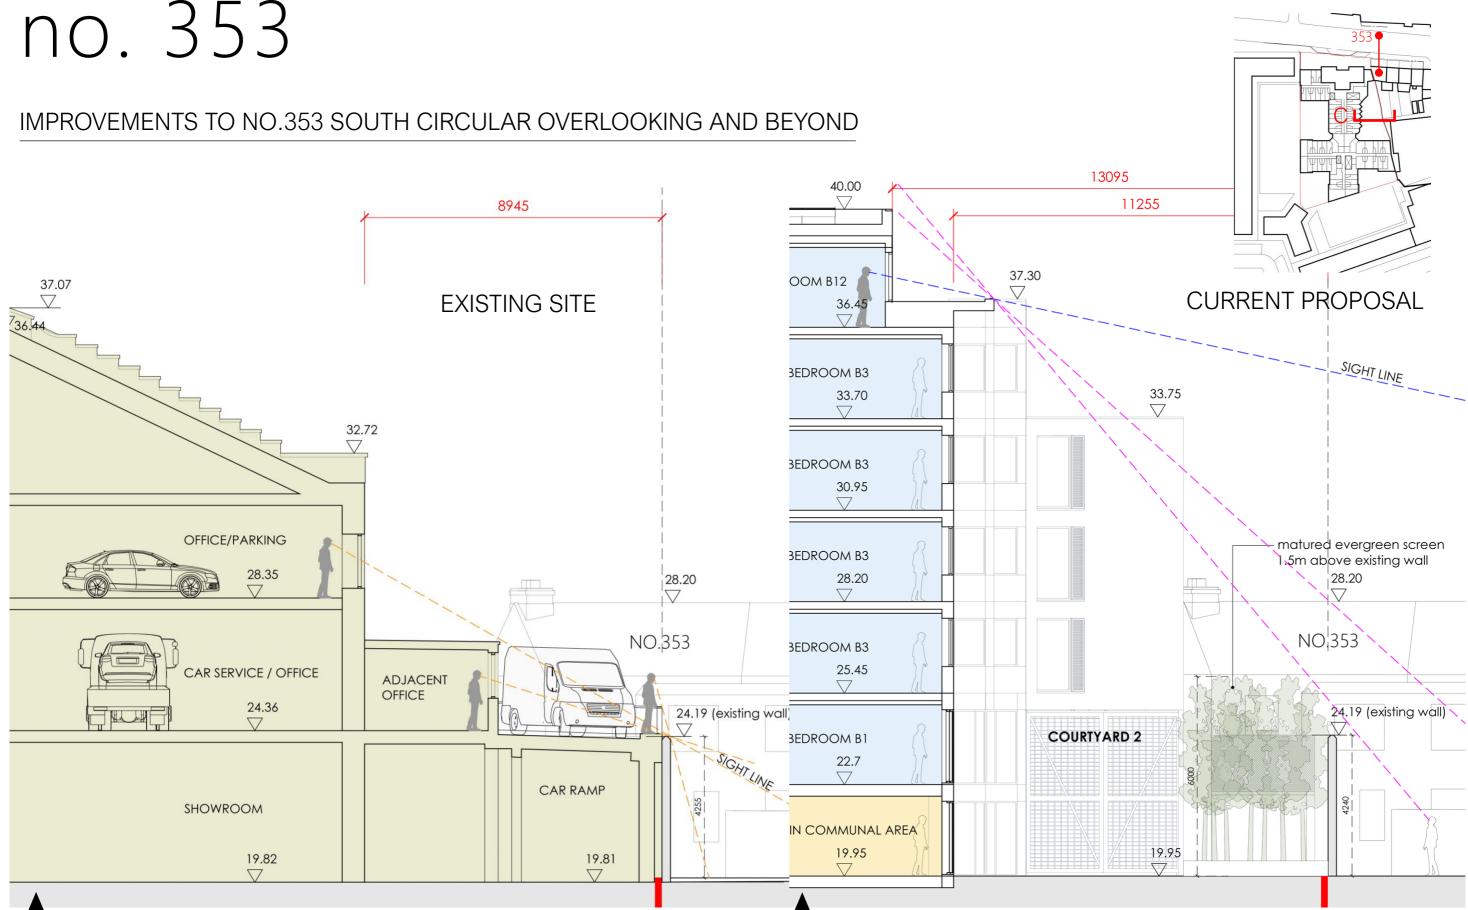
The existing building has considerable issues with regard to overlooking of the adjoining site No.353 to the East. The East façade is peppered with openings and glazing from office and workshop uses. The arrival ramp is also directly overlooking the boundary wall even at 4.2m high.
